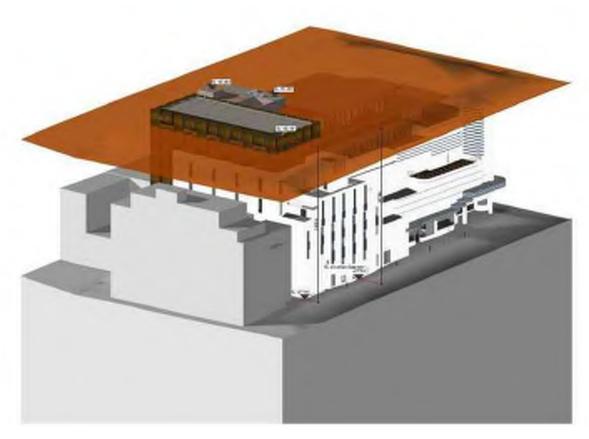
22m Height Plan Overlay - Axonometric View (Source: Tonkin Zulaikha Greer Architects)
